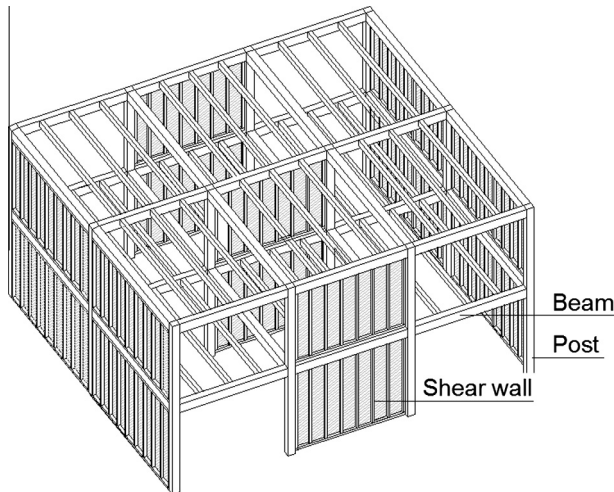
Example of a timber post-and-and beam structure braced with shear walls.
